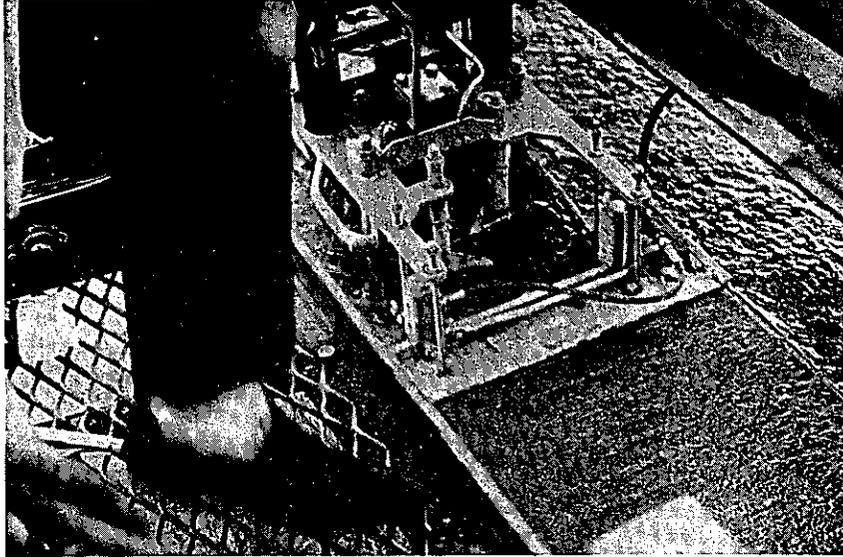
Top view of the inserter. Note finished concrete surface behind trailing edge.
